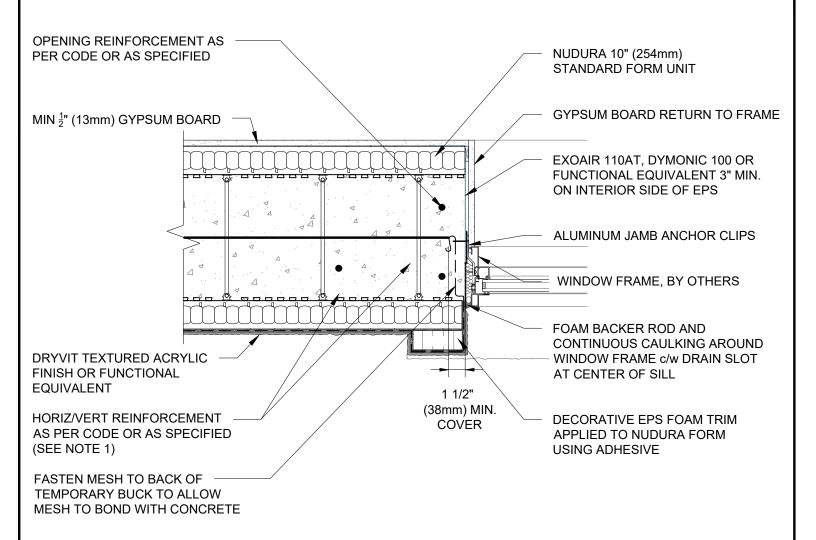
" (254mm) Form Unit, Window Head/Sill, Alumin Window, Concrete Mounted, EIFS Lamina Finish			, Aluminum Framed	F
